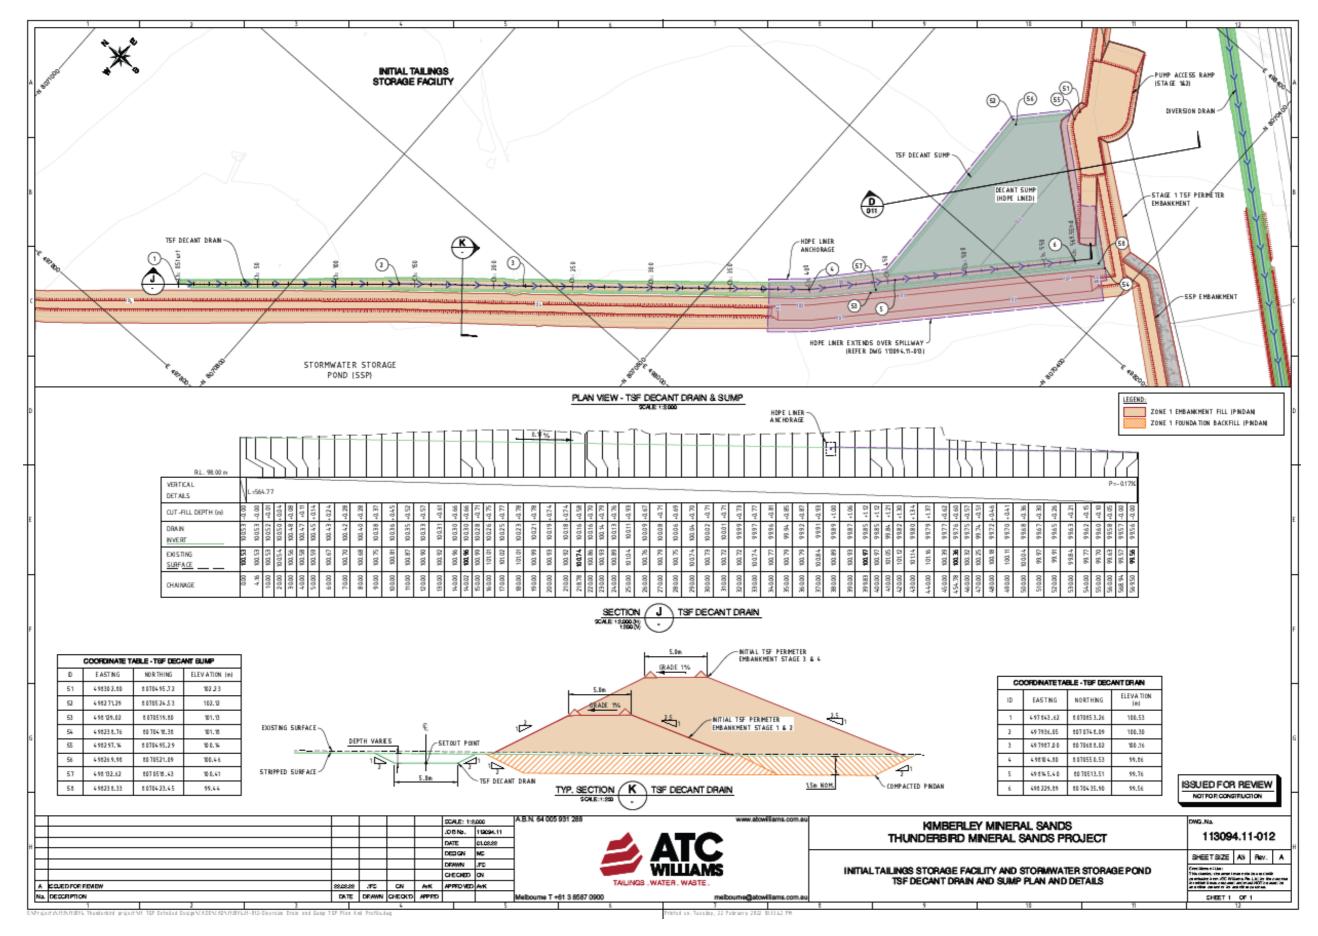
Drawing – Initial TSF and SPP, TSF decant drain and sump plan and details
